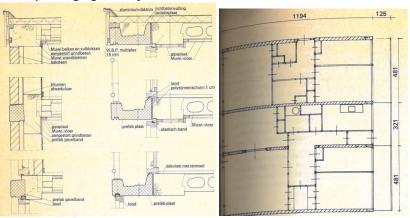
Facade section and plan of the Muwi system (Priemus & Elk, 1971)
